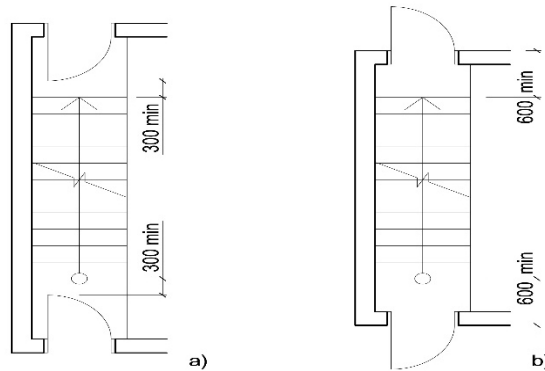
Location of doors on the landings of other stairways not used for escape (dimensions in mm)
